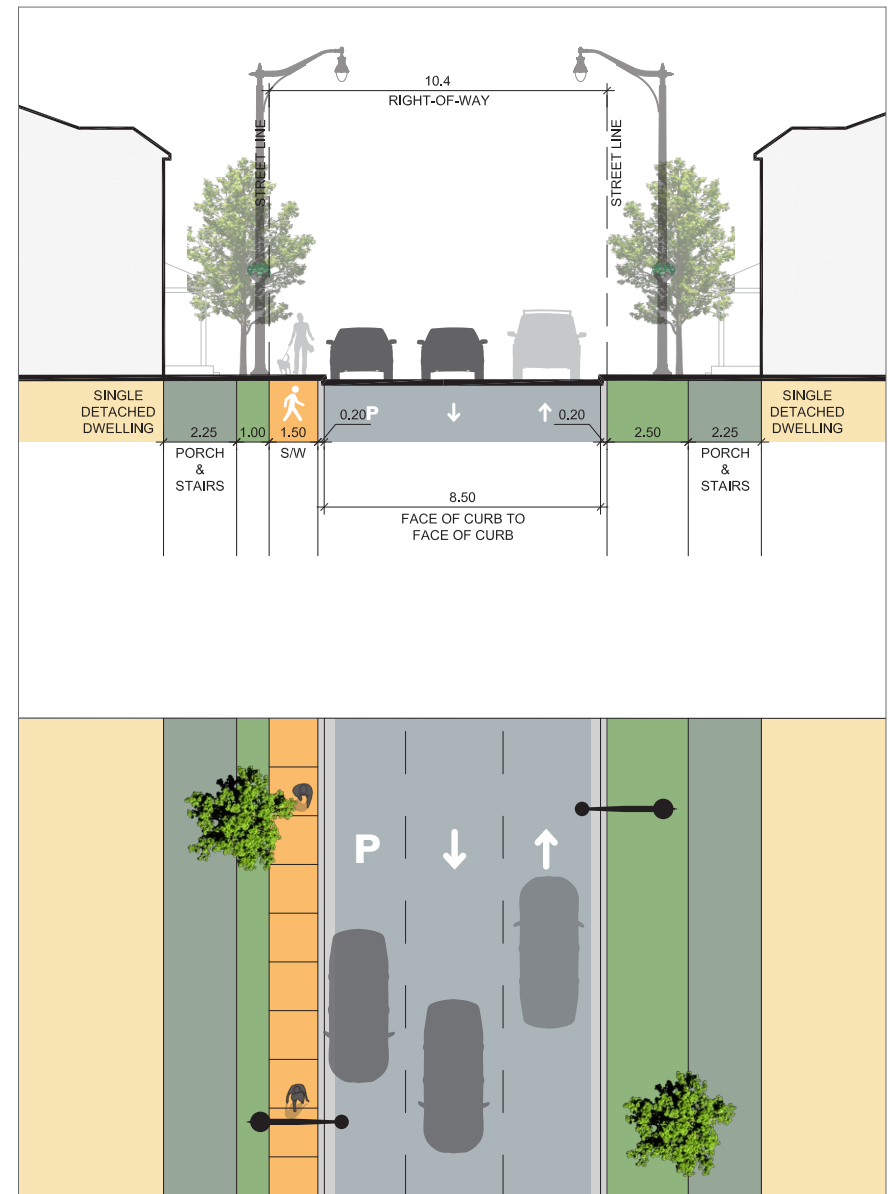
Conceptual cross-section of the 10.4m right-of-way condo road.
